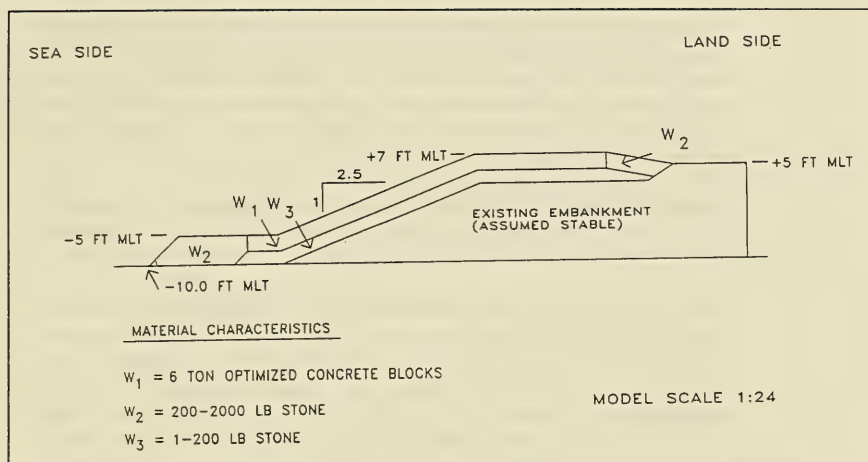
Optimized concrete block revetment cross section, Plans 7 and 7R
